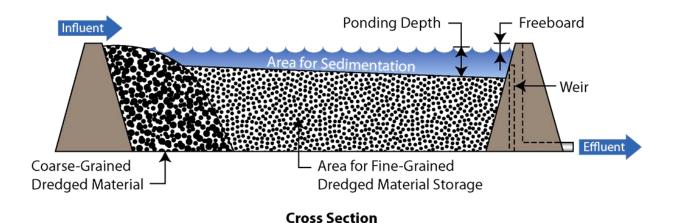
Conceptual Sediment Disposal and Dewatering Facility (Source: USACE 1983)
